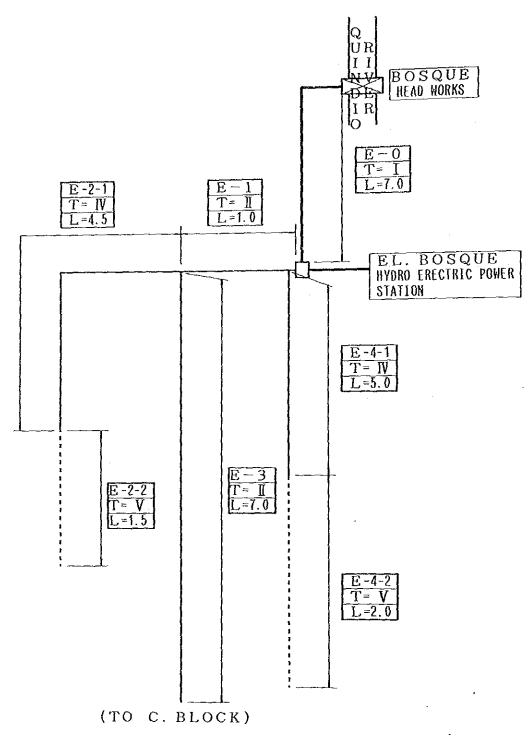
10 IRRIGATION SYSTEM PLAN (2)
